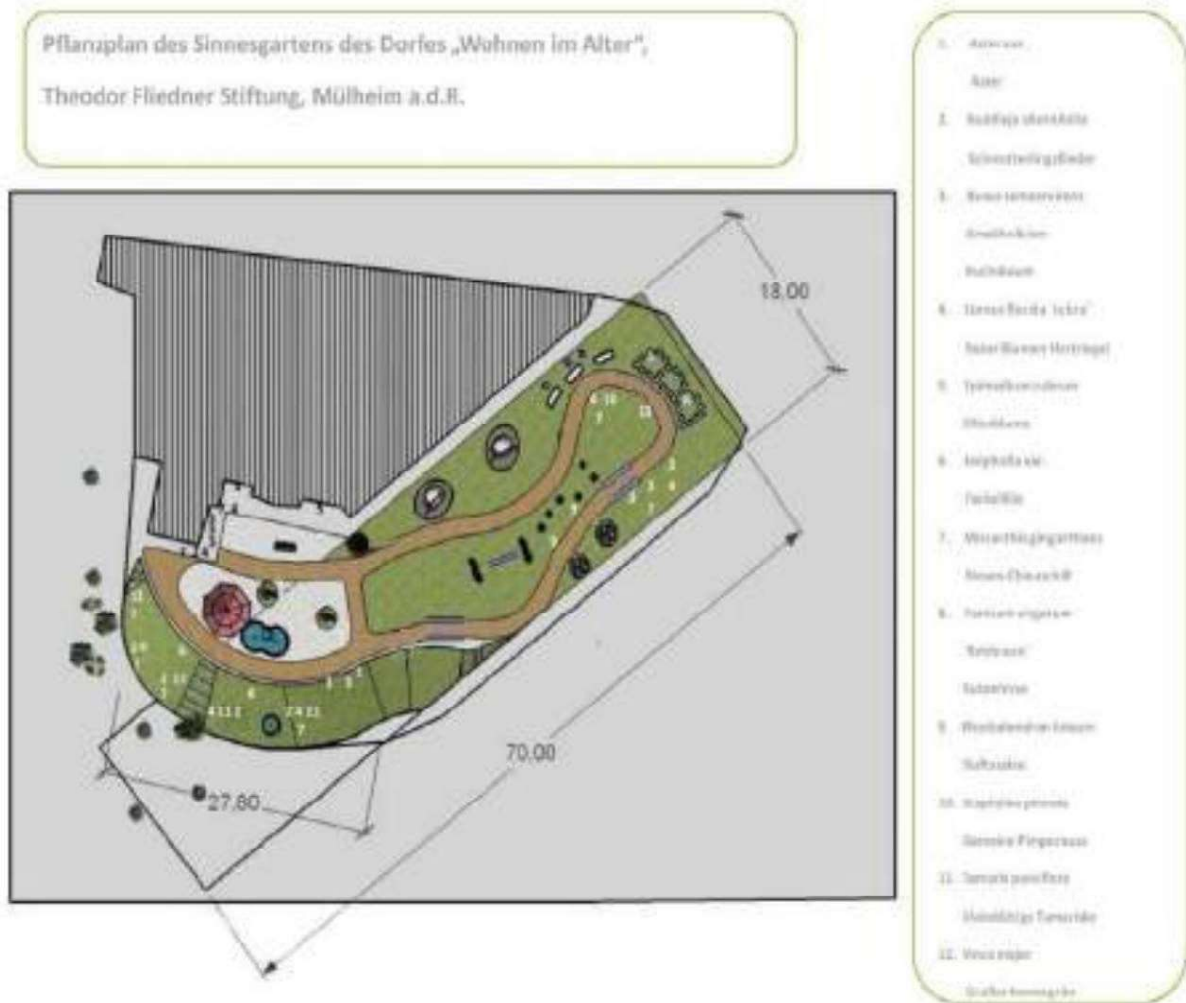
Planting plan for the dementia outdoor area of the village “Living in Old Age” called “Sensory Garden”.
